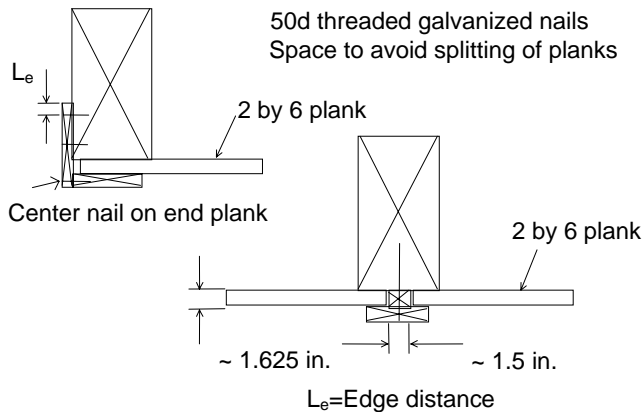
Test sound barrier connections viewed in cross section. 2 by 6 designates nominal 2- by 6-in. (standard 38- by 140-mm) lumber.
